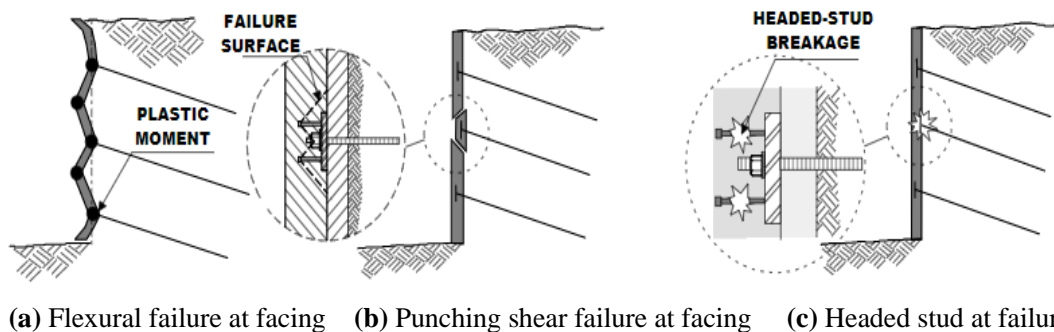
Modes of failure at facing (Lazarte et al. 2003)
